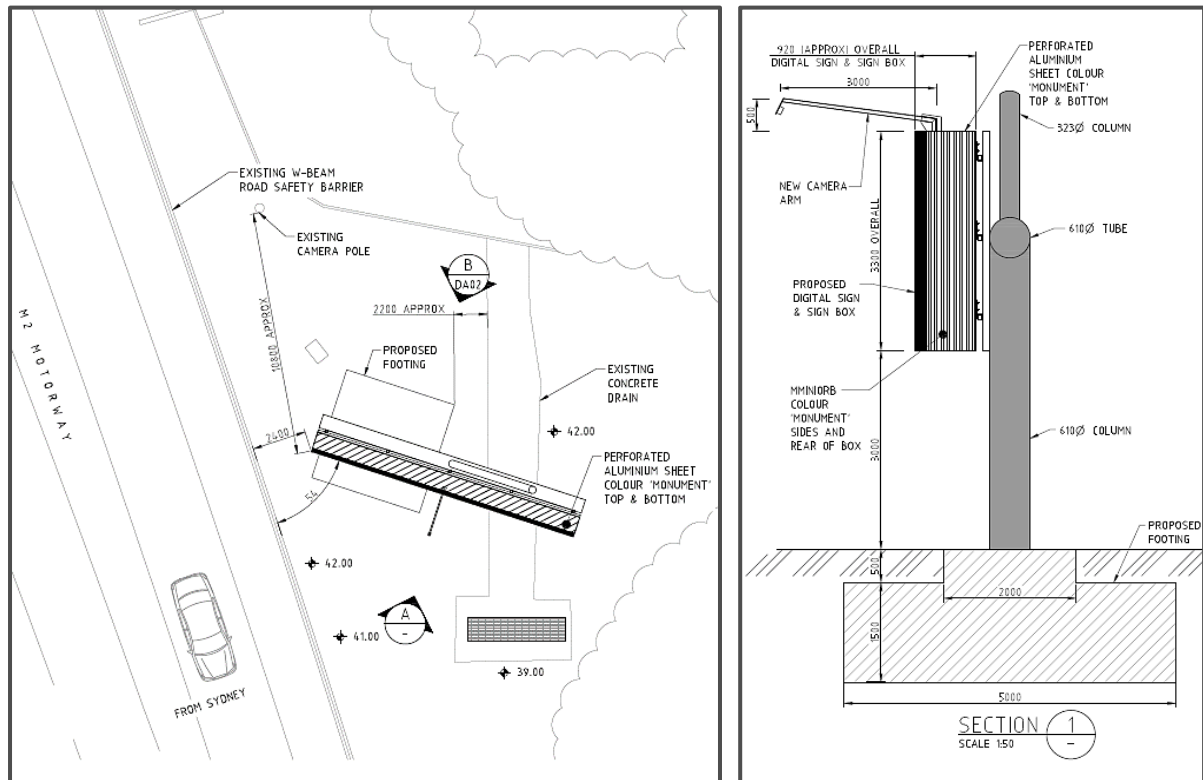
| Site Plan (left) and section (right) (source: Applicant's Engineering Plans)
